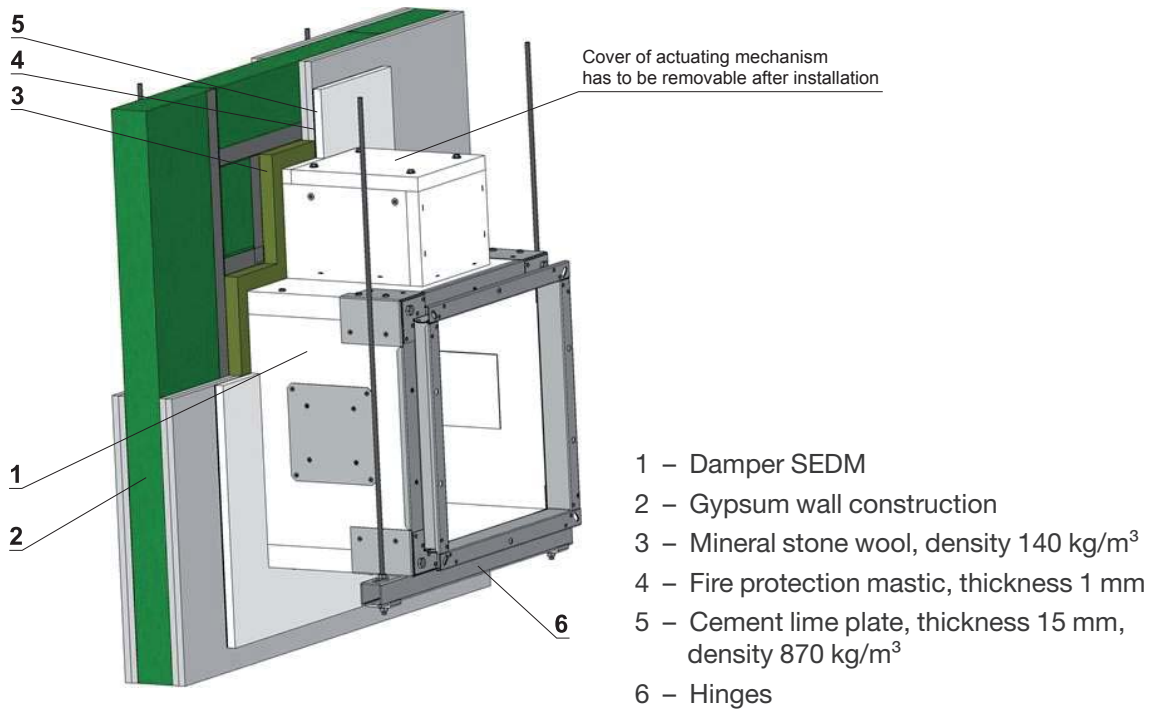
Example of installation in gypsum wall construction of fire compartment
